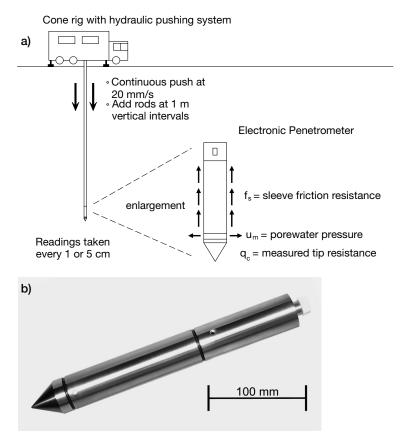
Cone penetration testing: a) test arrangement (after Mayne 2007) b) example of an electric penetrometer cone (courtesy of Geopoint Systems BV)
